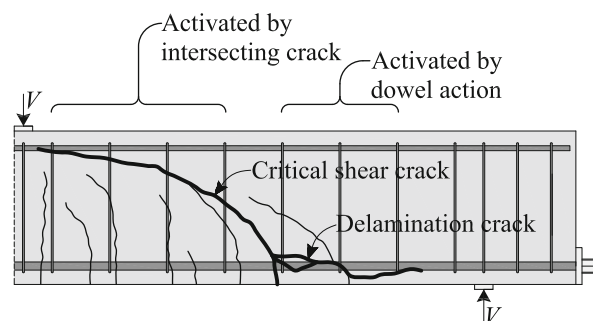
Stirrups activated by the intersecting critical shear crack and by dowel action of the tensile reinforcement.
